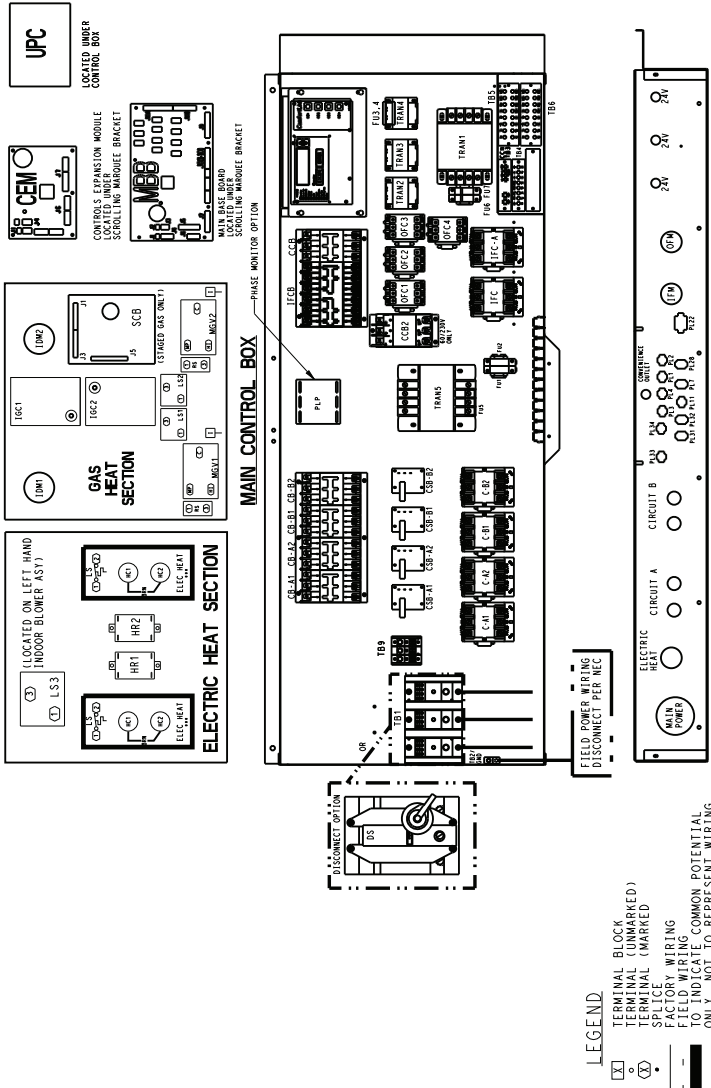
Typical Small Chassis Component Location (Size 020-035 Units)
